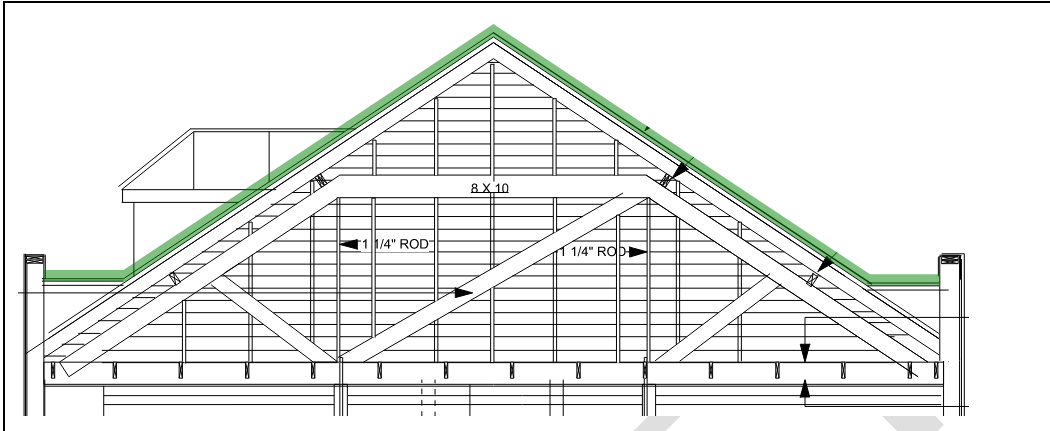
Example of an exterior insulated roof approach, with the plane of the insulation shaded green on a partial section drawing of the roof (drawing underlay source: Keay Architecture Ltd.).
